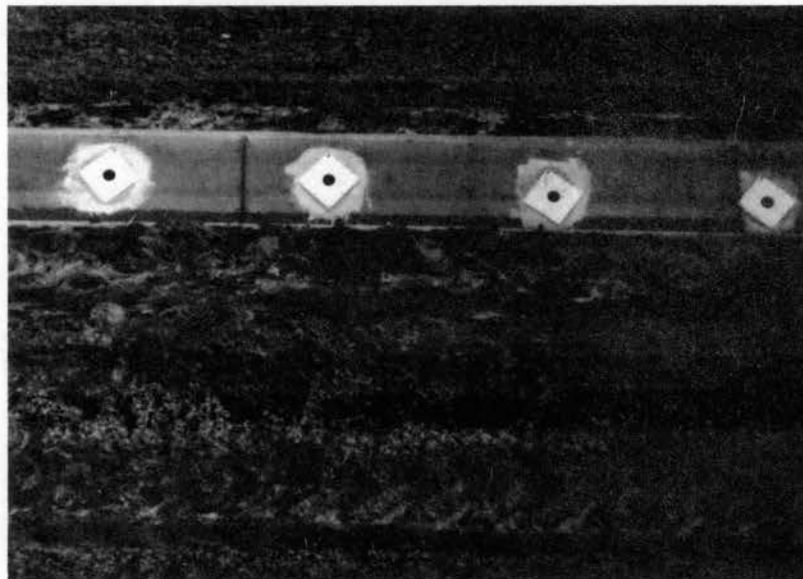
The Drop Between Bays is Demonstrated Between the Center Plates.
